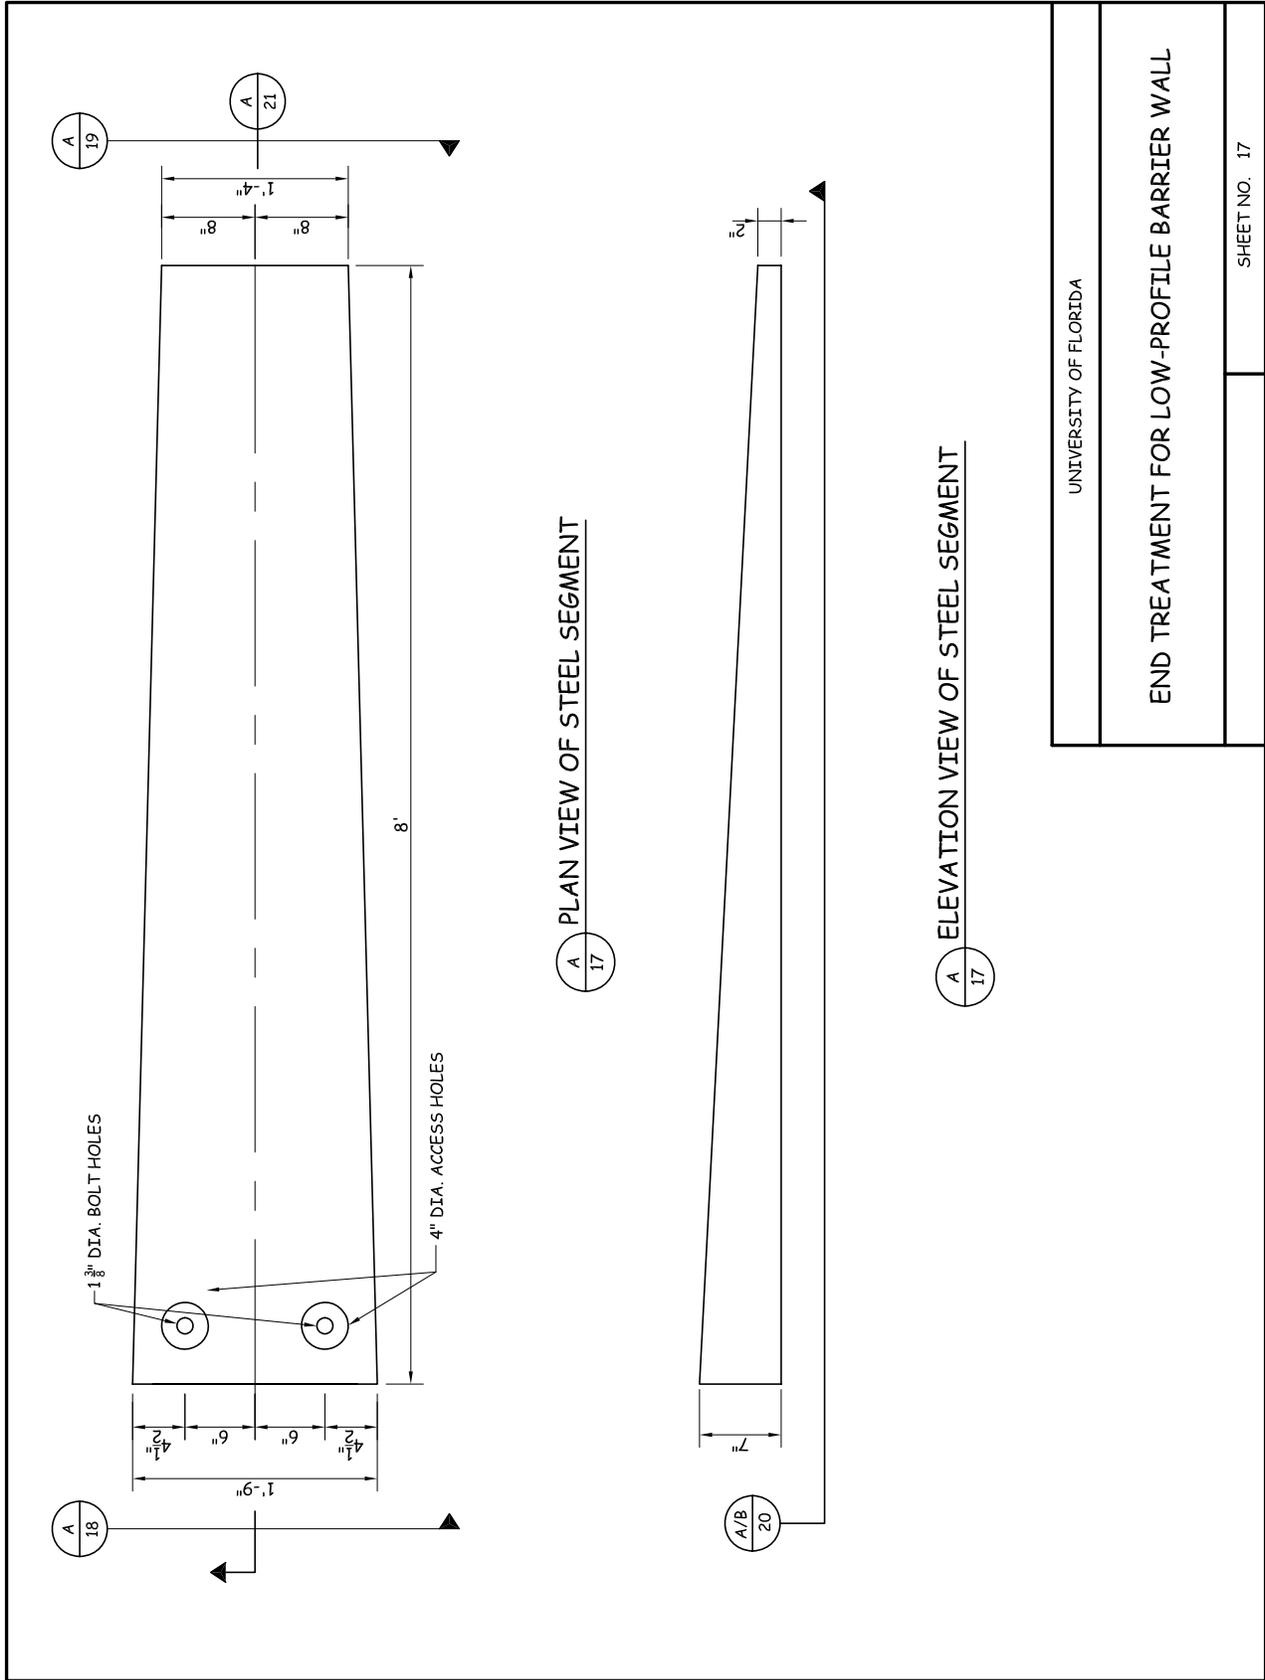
Drawings of Florida Concrete Curb End Treatment (6 of 14)
